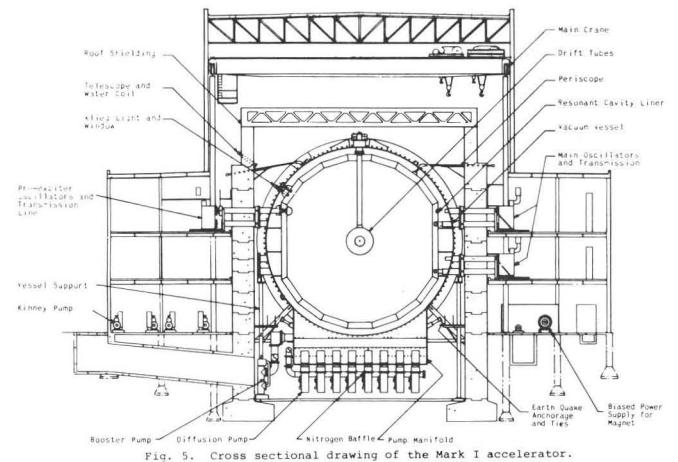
Cross sectional drawing of the Mark I accelerator.
